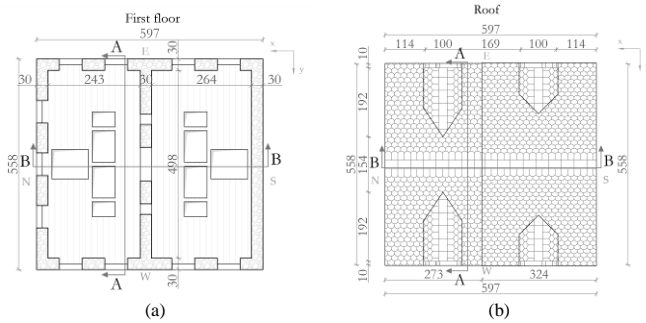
Plan views of the prototype: (a) first floor, (b) roof.
